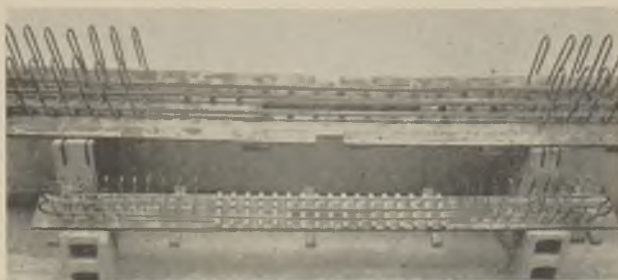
Reinforcement for 30-bar diameter splice. Lapped bars in contact. Specimen type A-30X.
